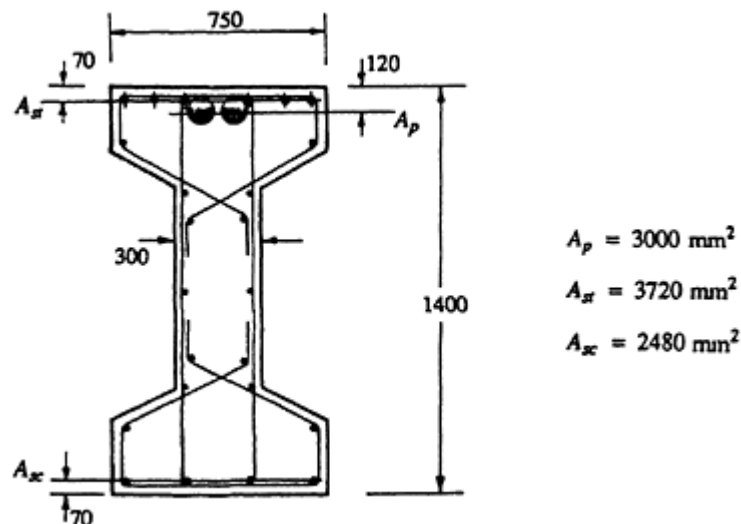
Reinforcement details on section over support C in [Example 9.6](#).
